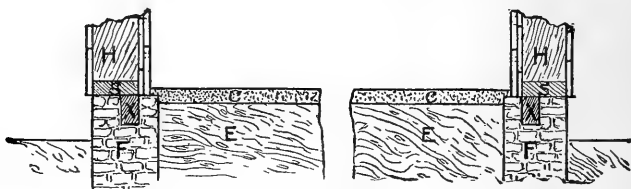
Section of bottom of silo. E, E, earth; F, F, foundation walls; S, S, sills; H, H, studs; X, X, anchors for sills; C, C, concrete floor.
